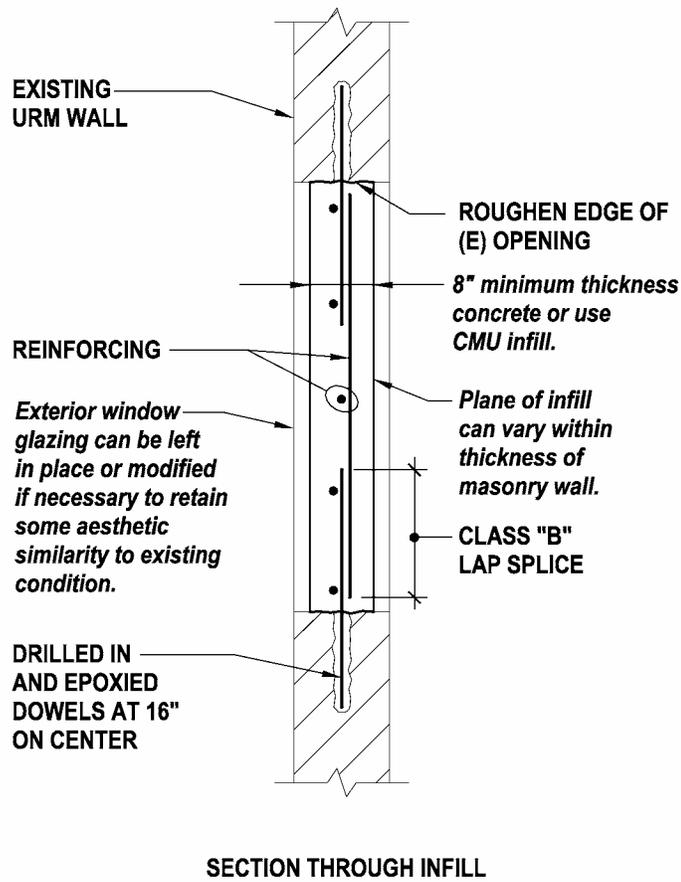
Infilling an Opening in a URM Wall
